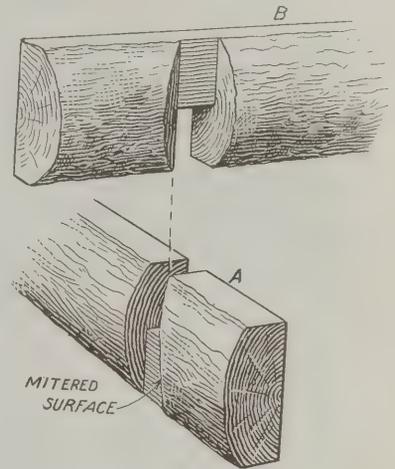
Showing How the Slabs Are Joined at the Corners
